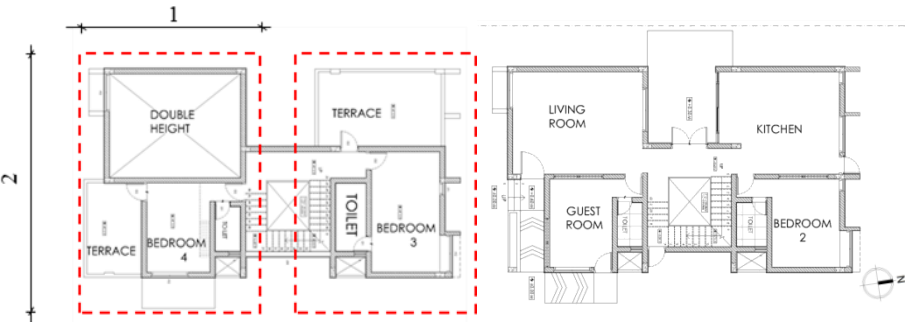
Ground floor plan (left) First Floor plan (right) (Source: Self)
